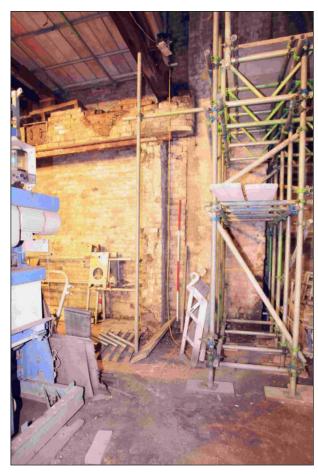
View of the junction of the east and central aisles on the south wall of G6 (Film 2.28)
